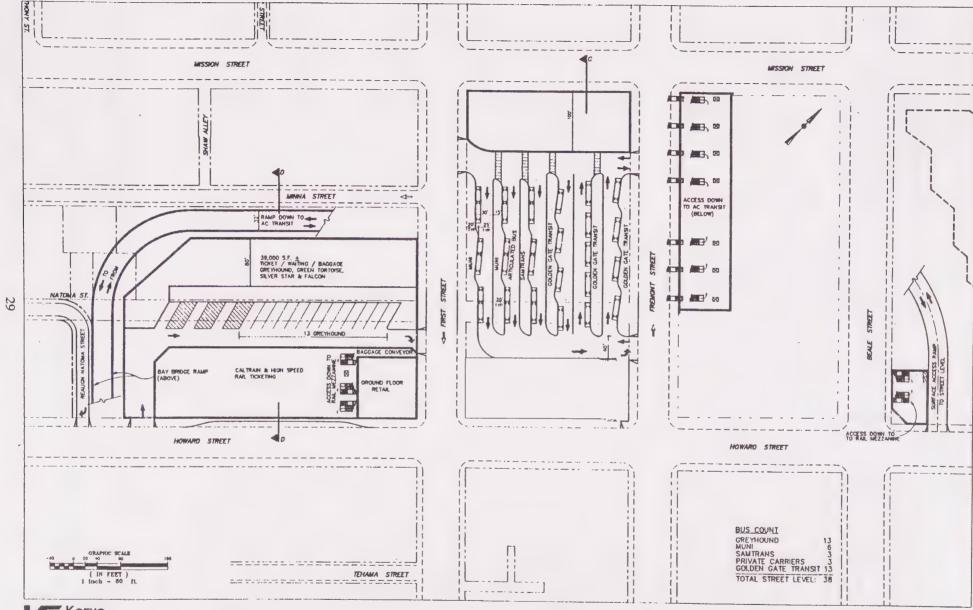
Alternative A-Existing Terminal Site Transit Terminal Street Level Plan
